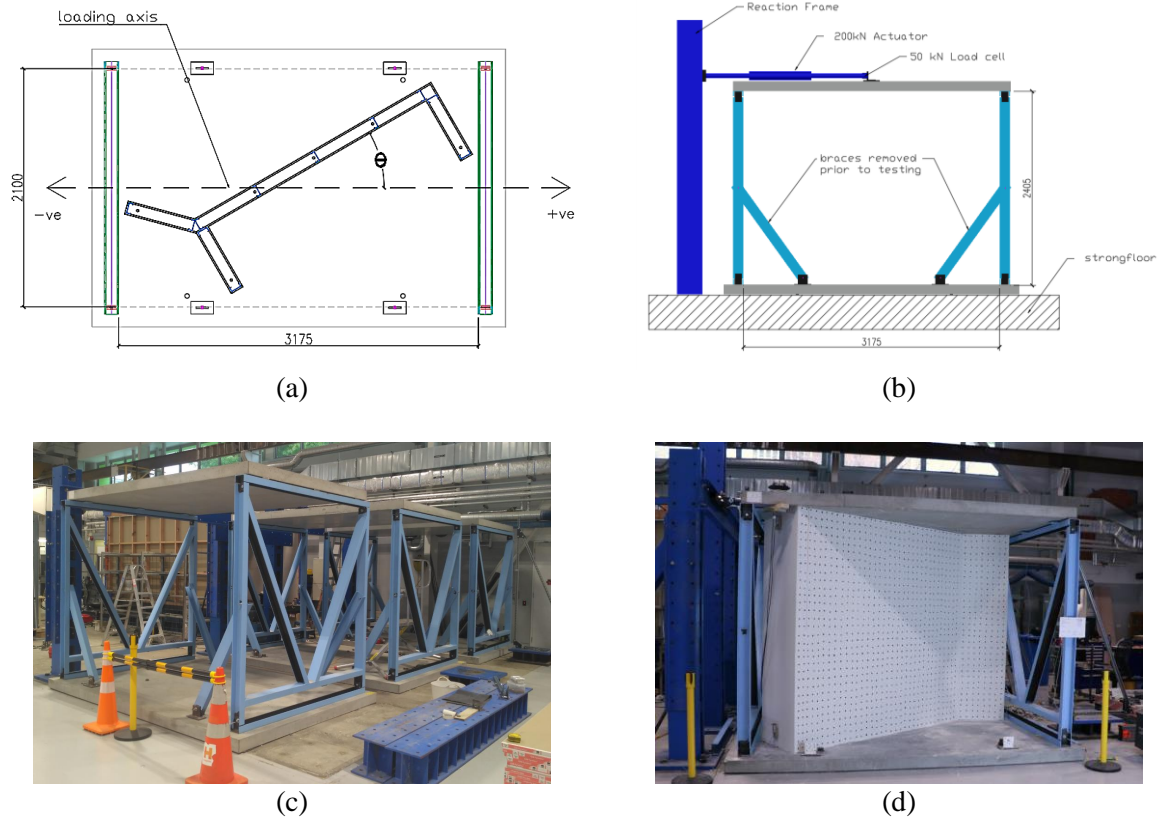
(a) Plan of testing frame (mm); (b) Elevation of testing frame (mm); (c) Photograph of setup; (d) Photograph of setup with specimen 1 installed.
